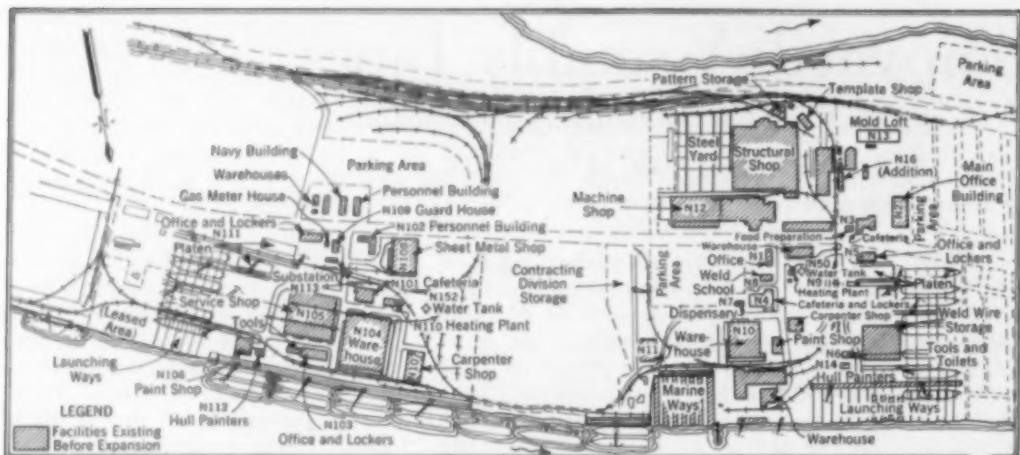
PLAN OF AN INLAND RIVER SHIPYARD (AREA BEFORE EXPANSION SHADED)
